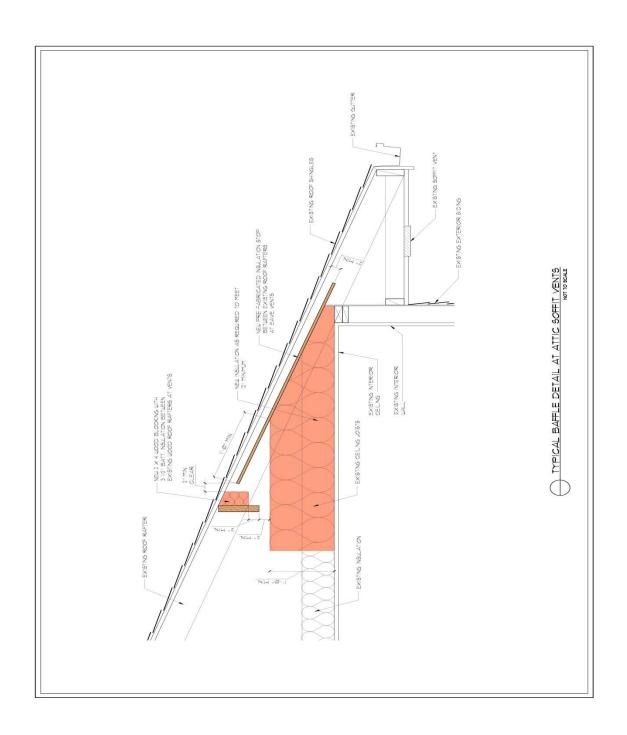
Typical Baffle Detail at Attic Soffit Vents
